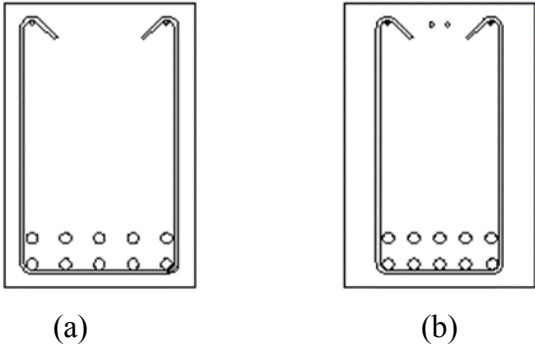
End stirrups for beams with (a) S, HE, and HNE2 detailing and (b) HNE detailing
